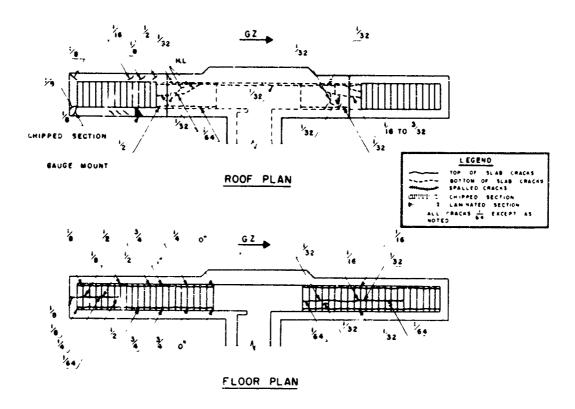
Entrance crack pattern, structure.II-3.
